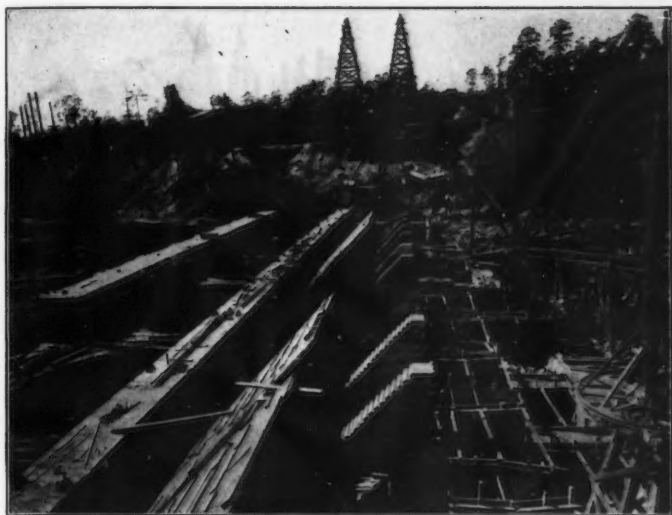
CRADLES FOR PENSTOCK FORMS. SECOND STAGE OF CONSTRUCTION COMPLETED.
